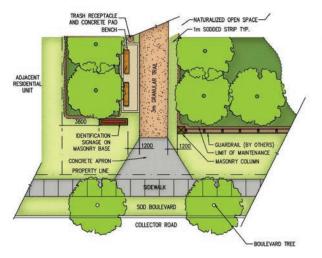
Block Plan with identified proposed trail types and locations, as well as potential trail entry classifications and layouts
